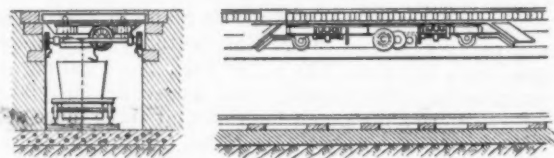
Longitudinal and Cross Section of Stock Tunnel.
